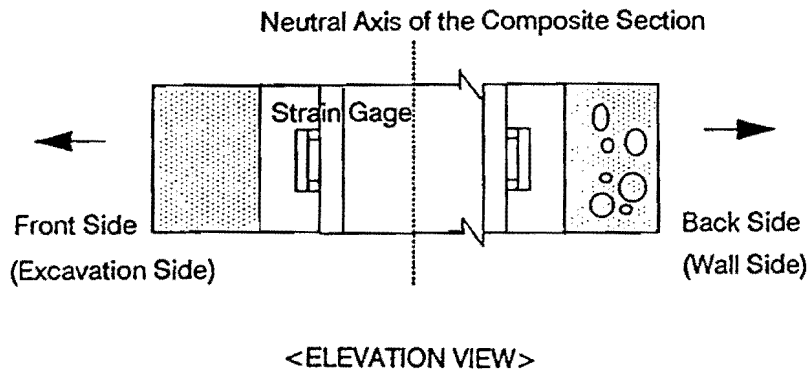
Cross Section of Drilled Soldier Beam Below Final Excavation
